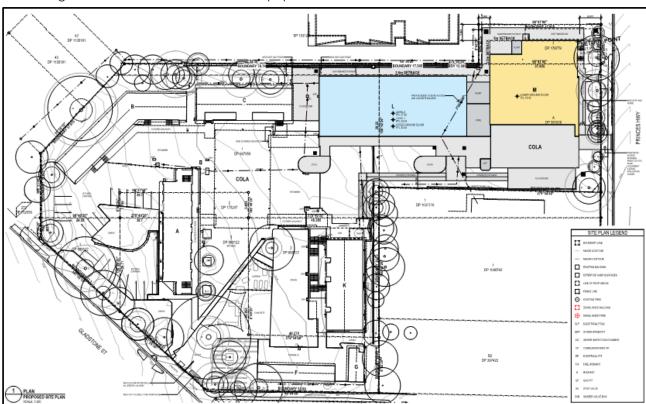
SCHEMATIC SITE PLAN OF KOGARAH PUBLIC SCHOOL UPGRADE
